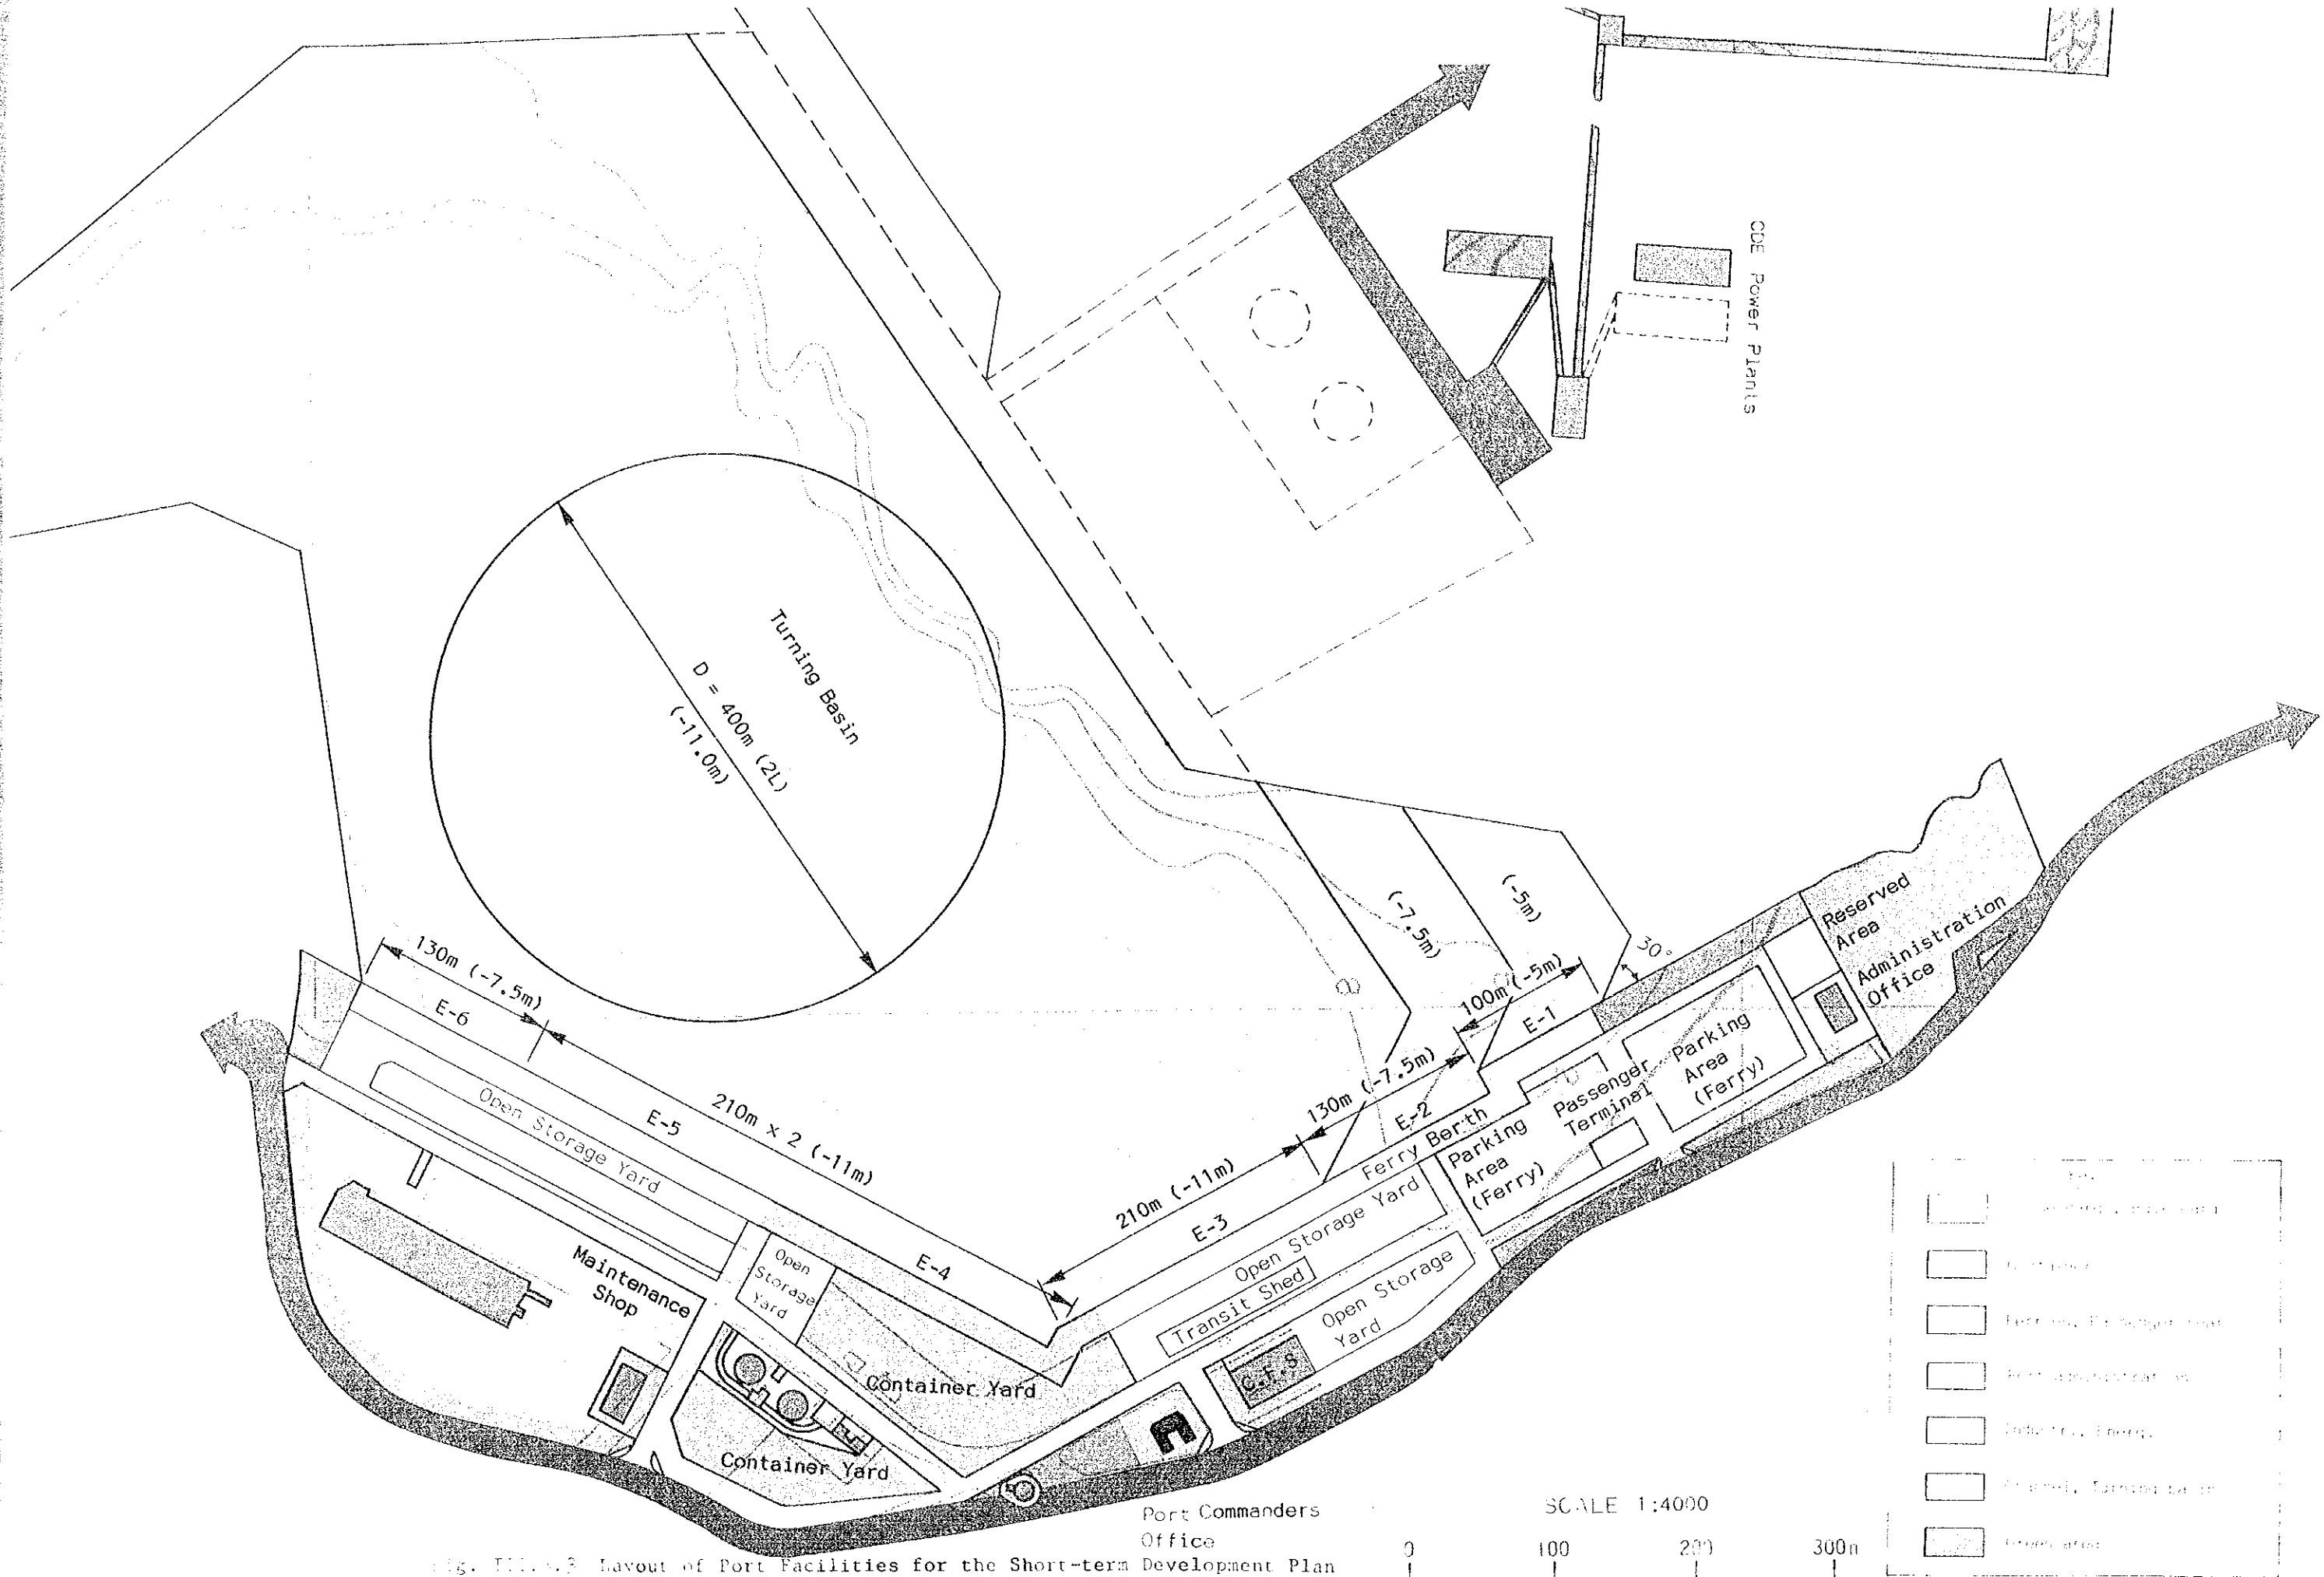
Layout of Port Facilities for the Short-term Development Plan
